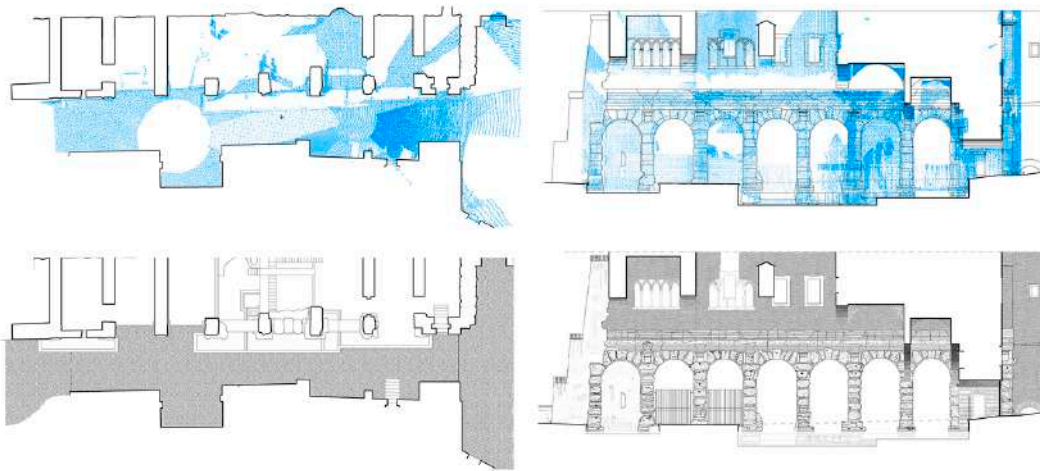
The Botany Institute. Architecture reconstruction through BIM processes. Details of ground floor, windows and walls (software: Autodesk Revit 2017).
